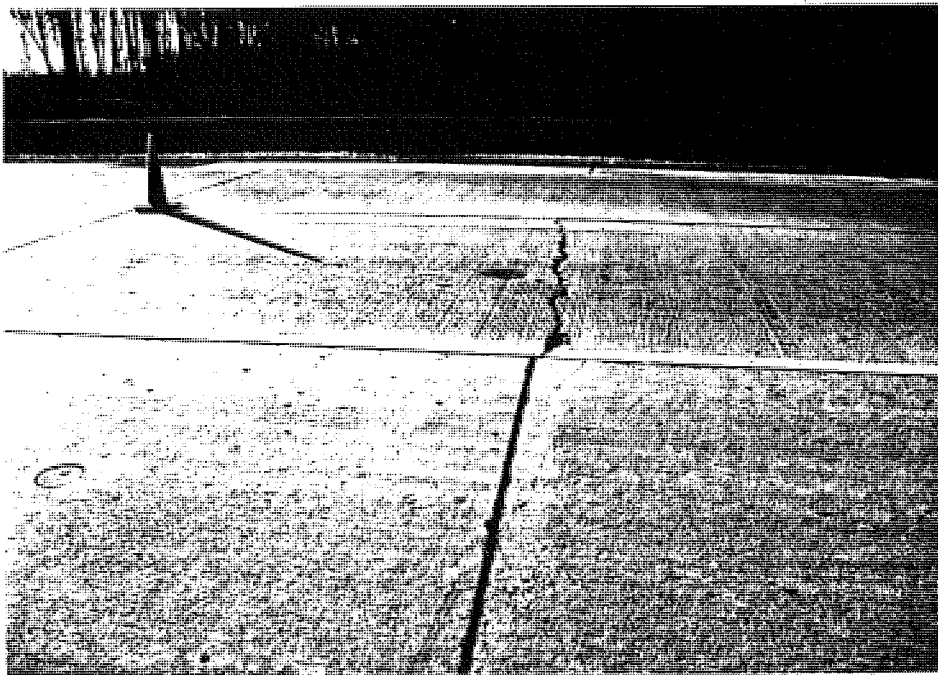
Typical crack pattern in section MI 1-3, recycled concrete on 5% cement-stabilized peastone base course.
